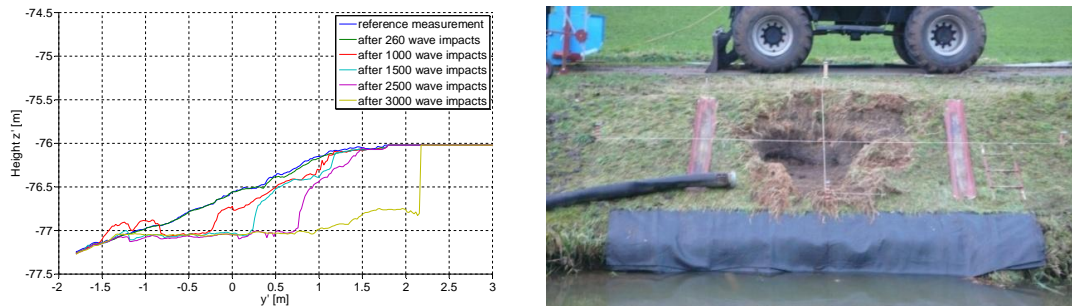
Test Section Ol.1. Left: erosion development, right: test section after 3000 impacts.
